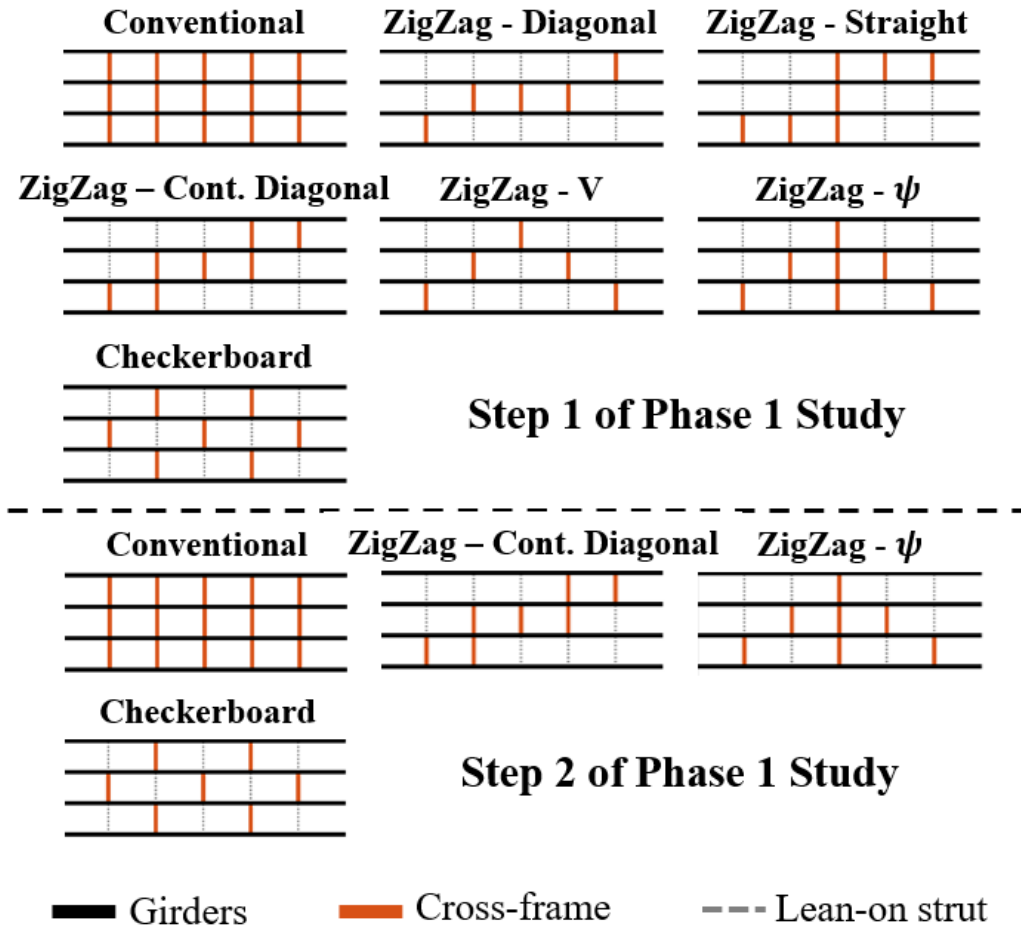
Configurations Considered in Preliminary (Step 1) and Initial Layout Study (Step 2)
